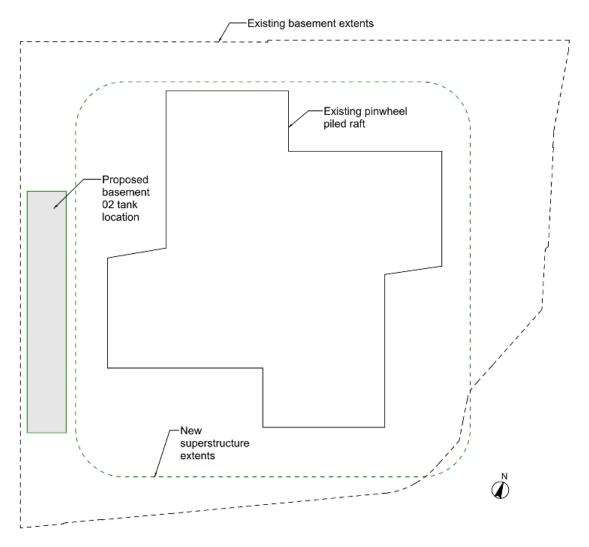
Proposed Basement 02 plan (extract from 3XN drawing no.: ET\_DR-A\_20098)
